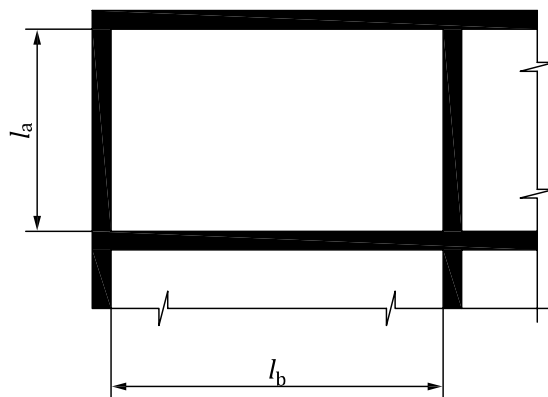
Corner panel of two-way slabs supported on girders, beams or structural concrete walls
